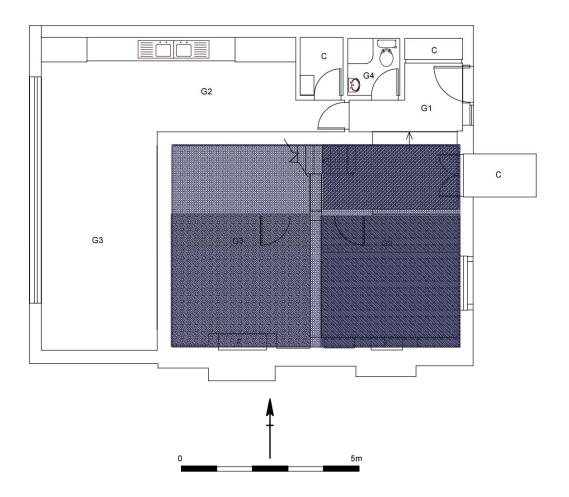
Original floor plan shown in blue. Dark blue indicates readily identifiable rooms (*scale 1:100*)
